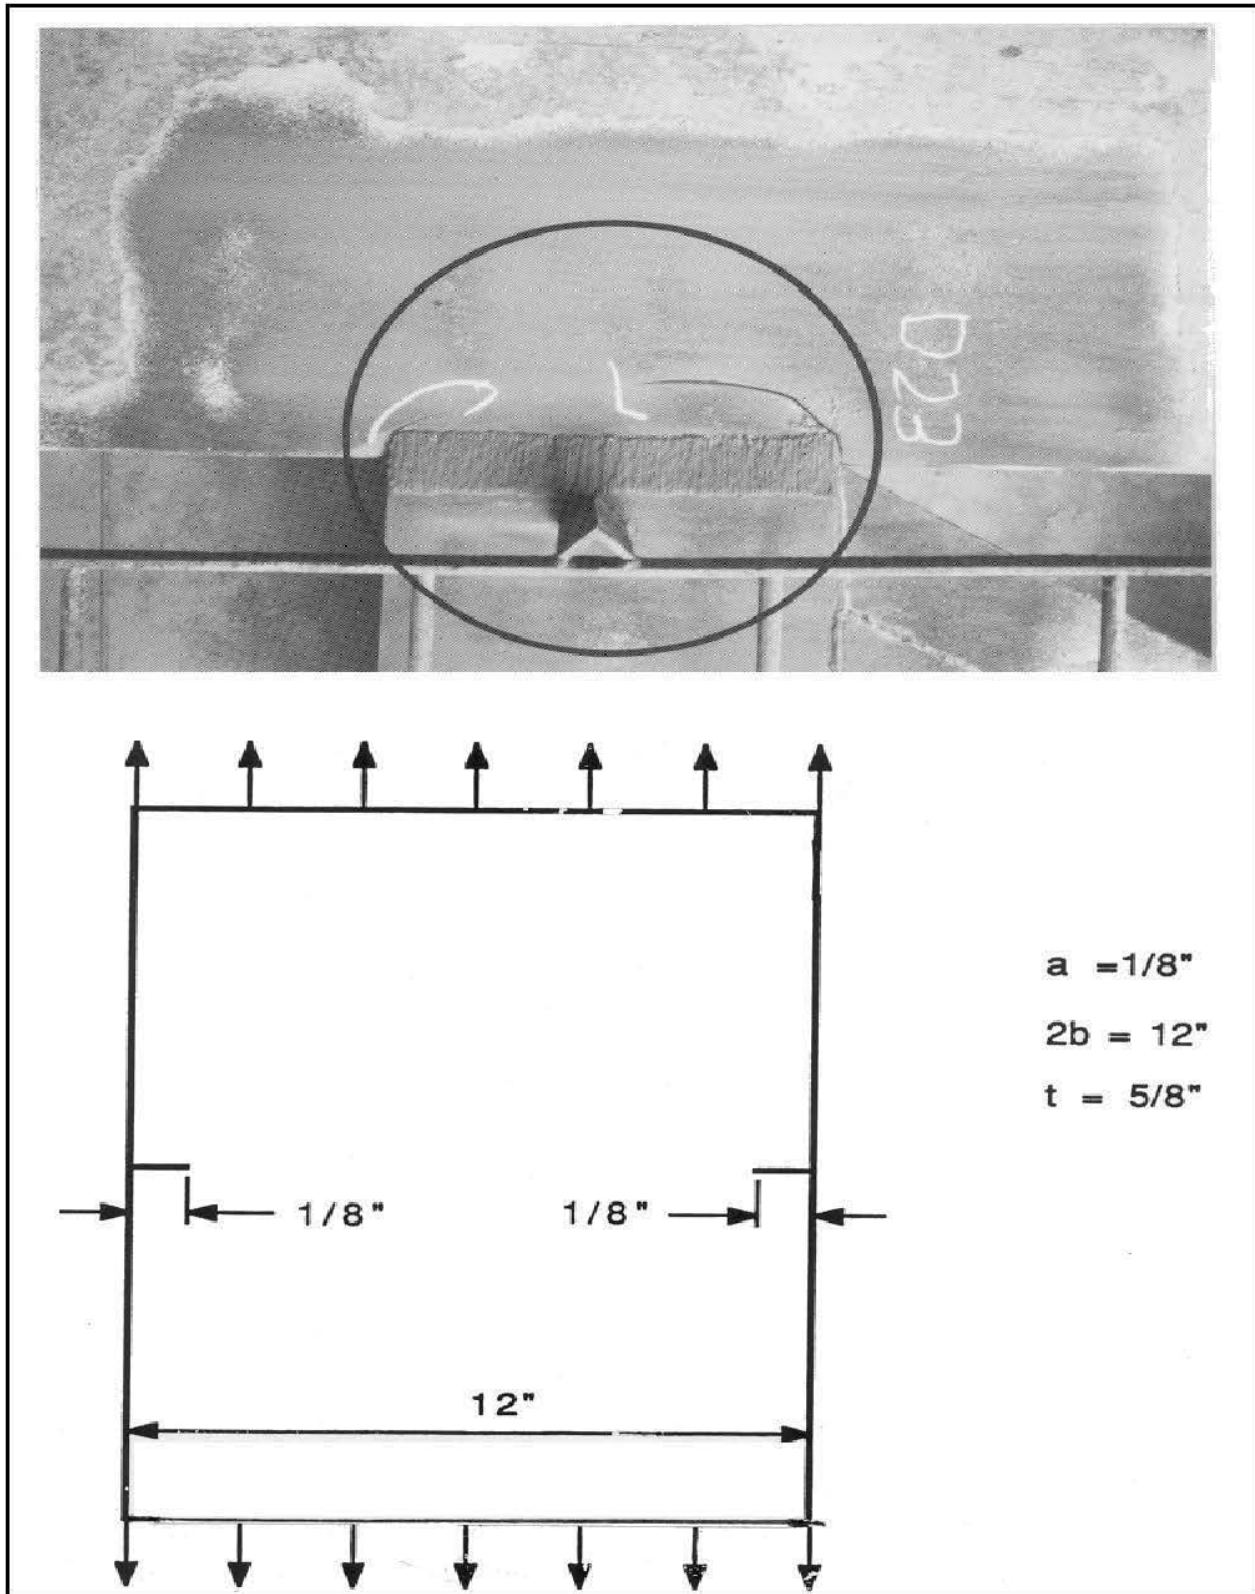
A double-edge cracked flange (1 in. = 2.54 cm)
